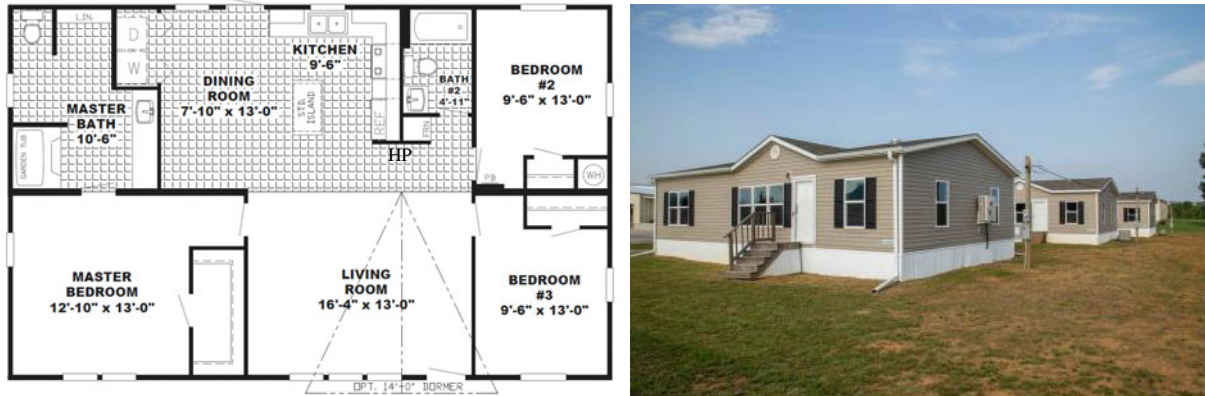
Lab house floor plan (left) and site with test homes installed (right).
